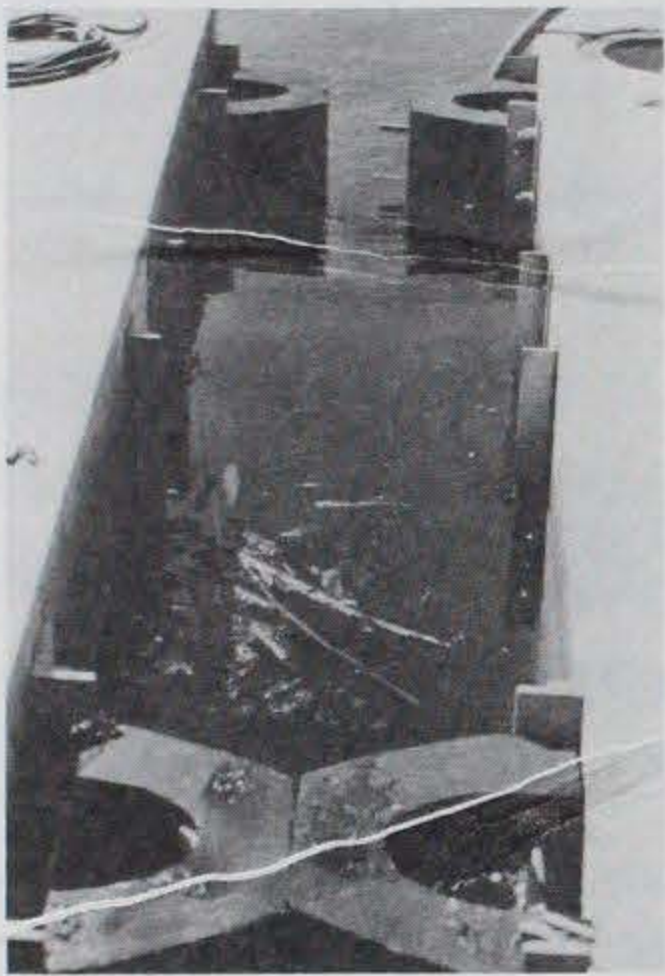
Vertical fender connector separating after 3 days at the test site.
